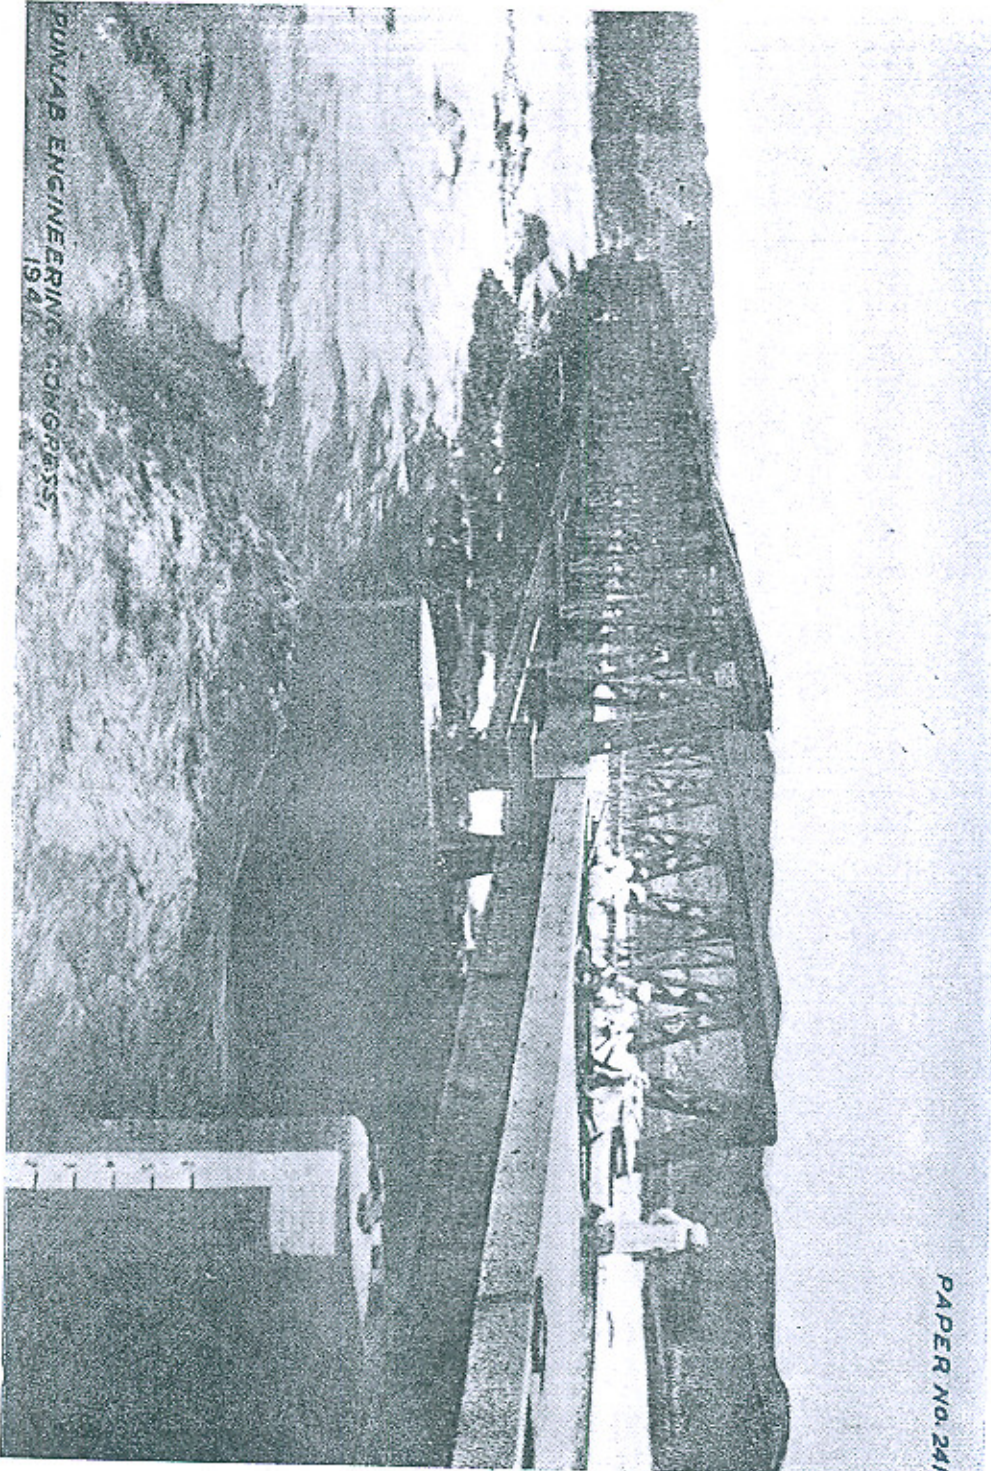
DHOKPATHTAN BRIDGE.
